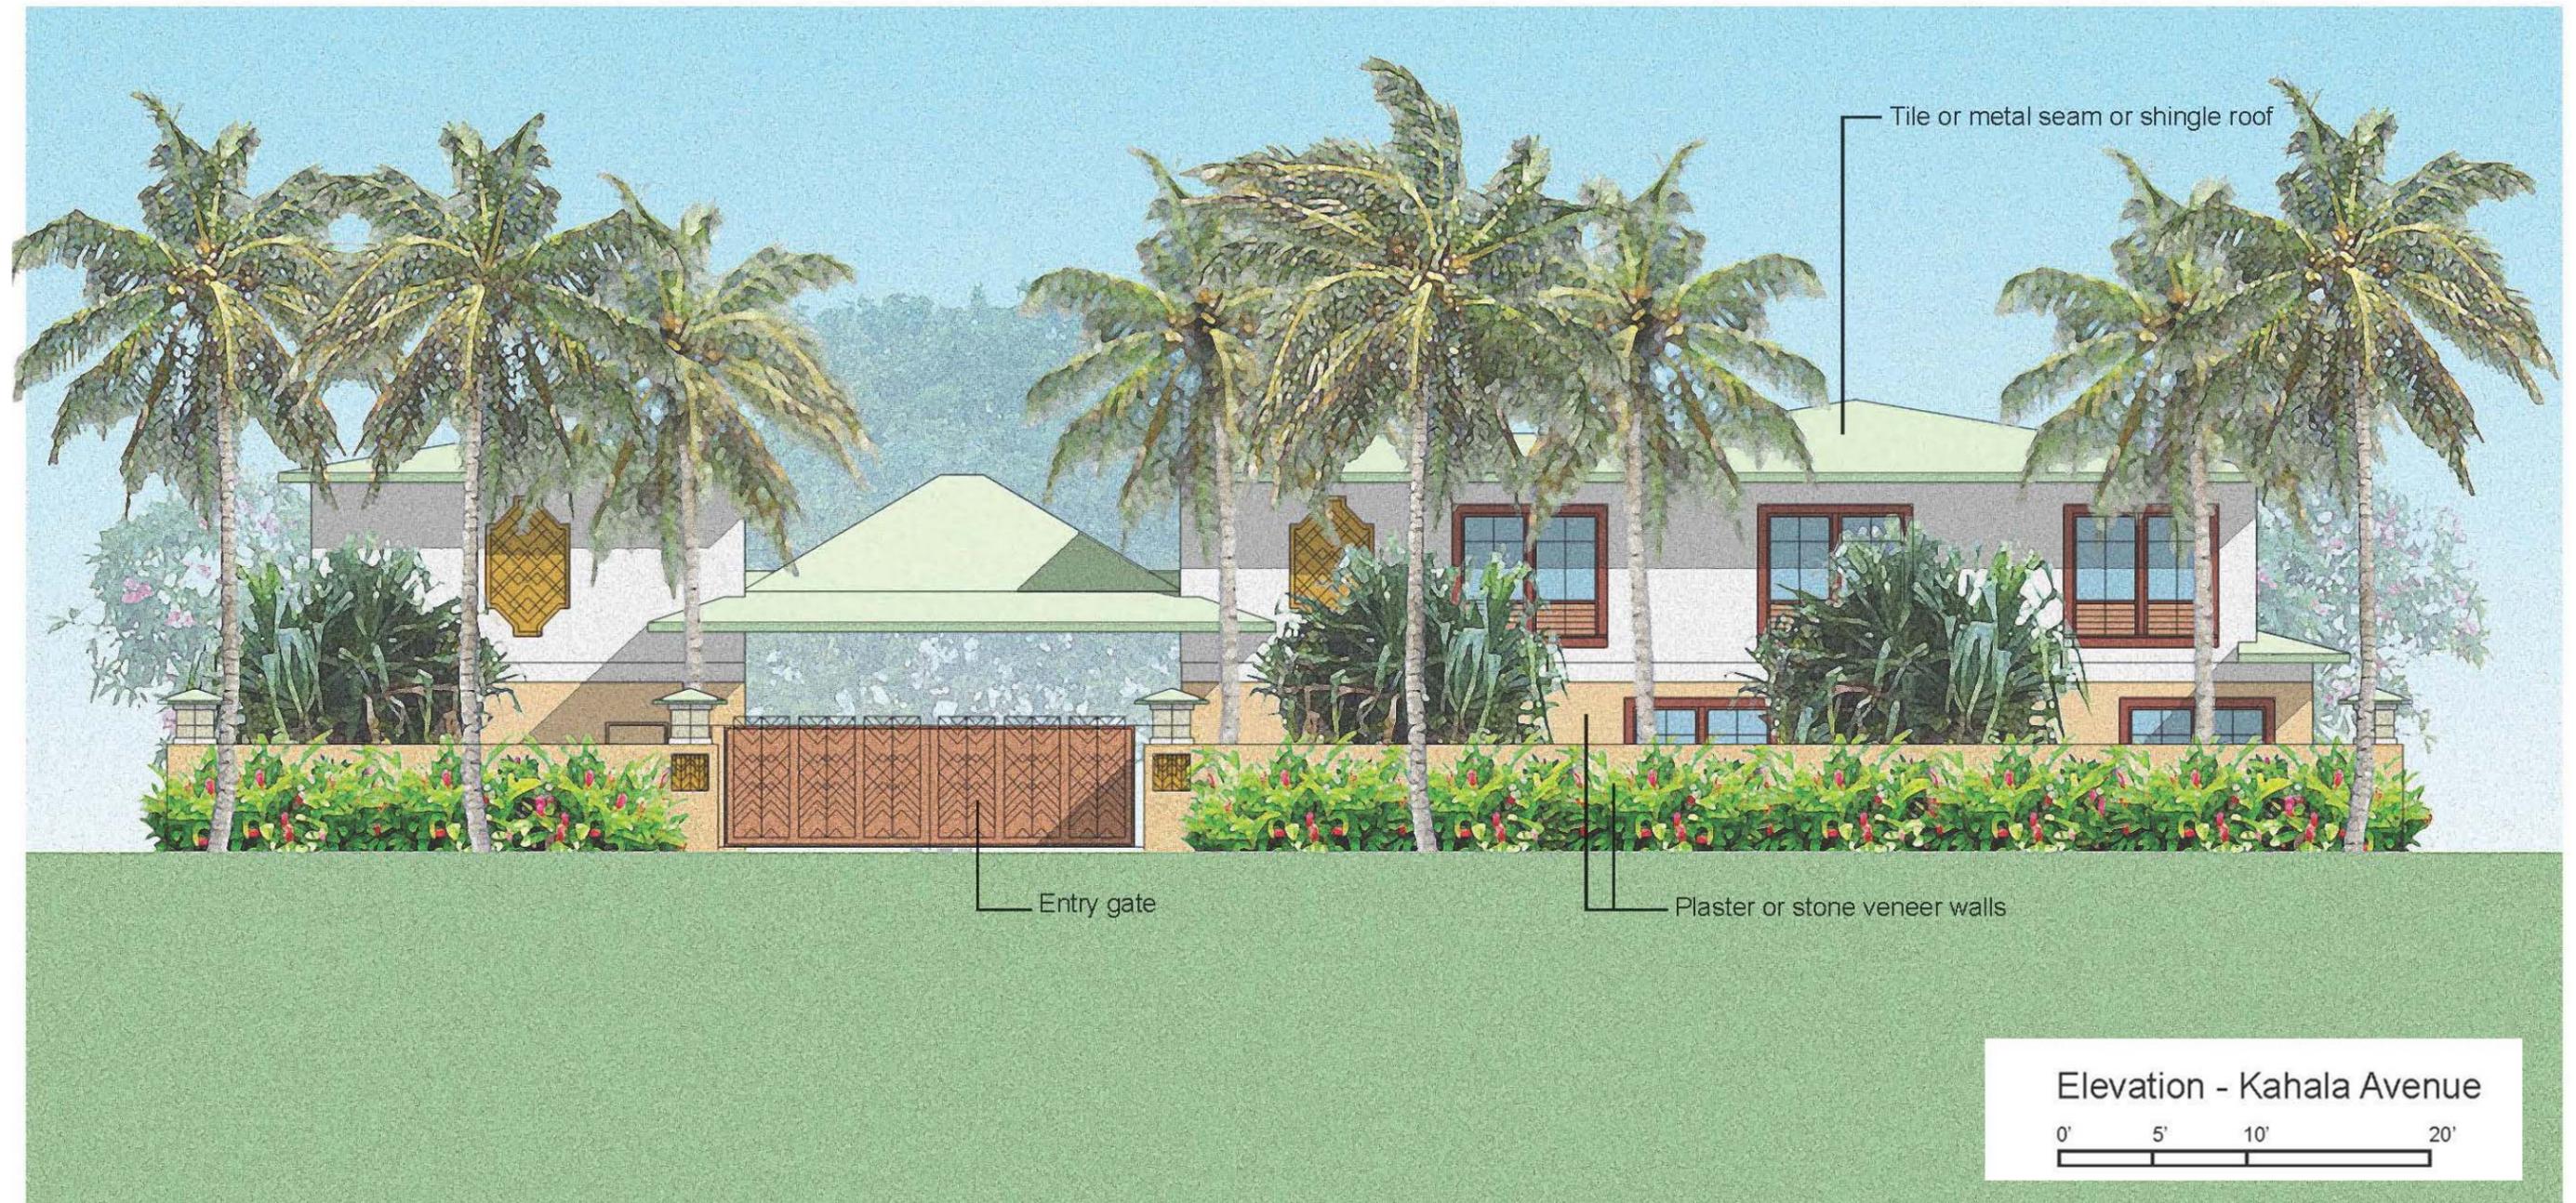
ELEVATION – KĀHALA AVENUE (NOT TO SCALE) (2/7/14)
